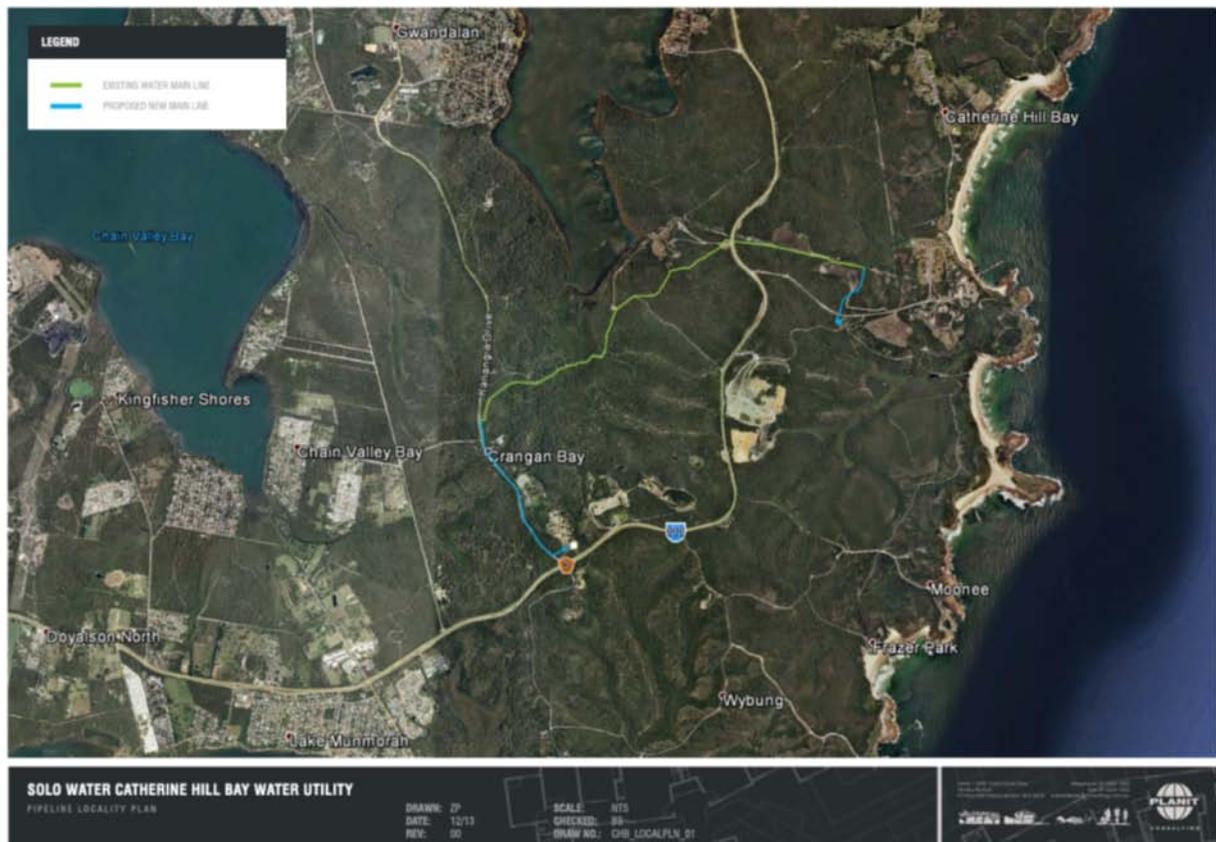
Locality Plan Noting Proposed New and Existing Pipe Locations
